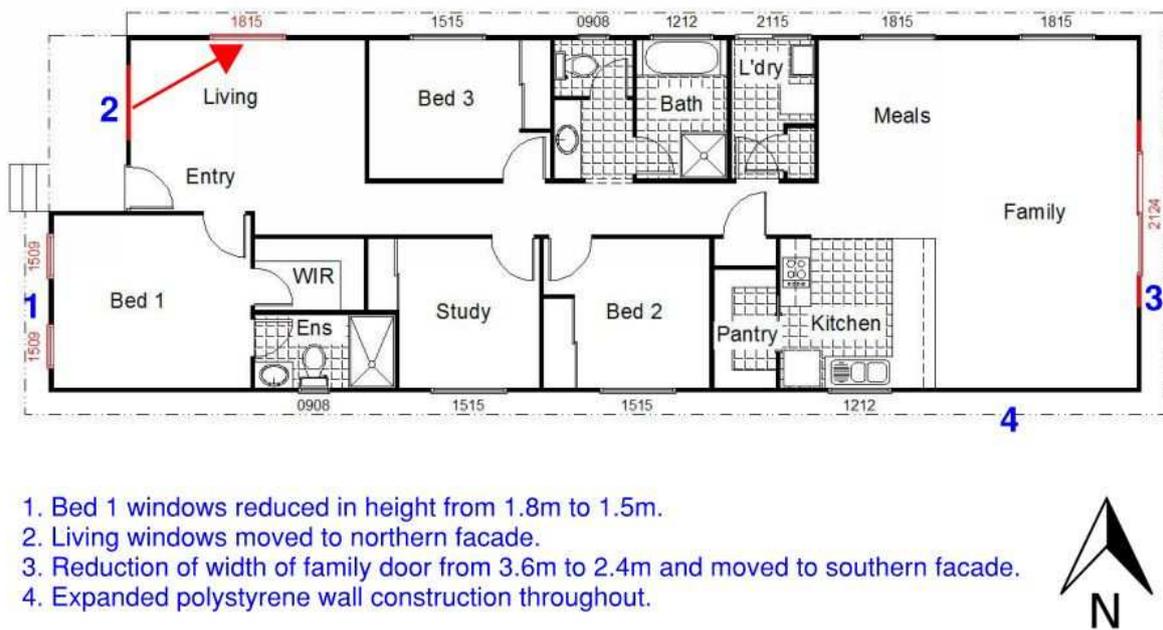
Redesigned floor plan for Dwelling 6 in Canberra, Hobart and Melbourne.
